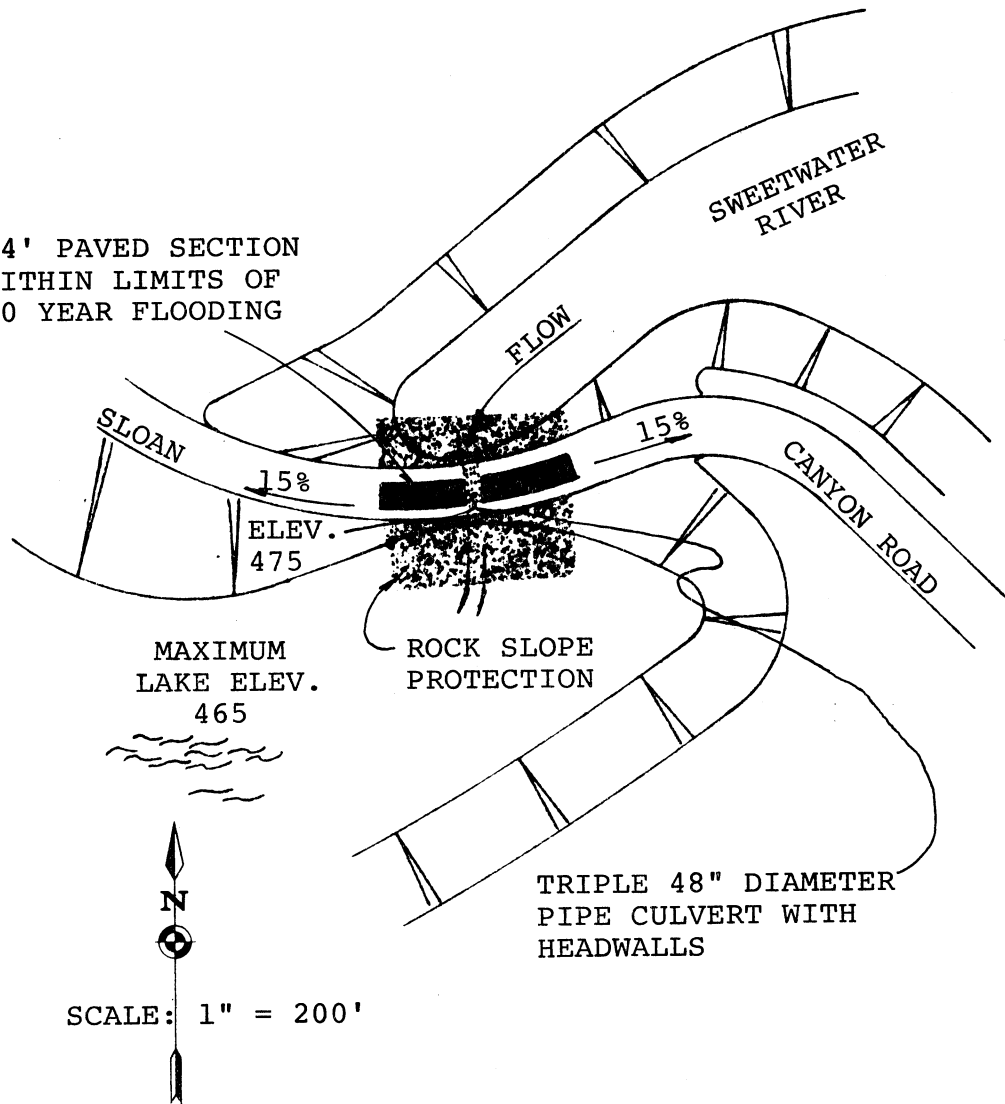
and 4 illustrate proposed ford and culvert construction at the Sloan Canyon Road crossing of Harbison Canyon Creek and Sweetwater River. These facilities will be designed to provide a dry crossing under minor run-off conditions and to confine the breakover of a 10 year flood within the limits of the paved section of roadway. Headwalls will be installed on the culvert systems and rock slope protection will be placed on slopes subject to erosion. The precise design details will be shown on the grading plans.
